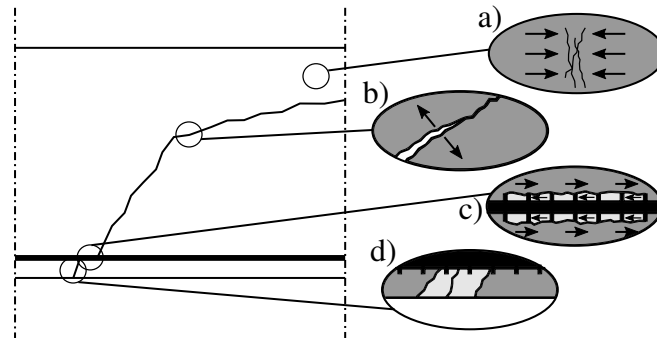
Fracture modes used in shear models based on fracture mechanics: a) shear-compression fracture; b) diagonal shear fracture; c) interface bond fracture; d) splitting fracture
